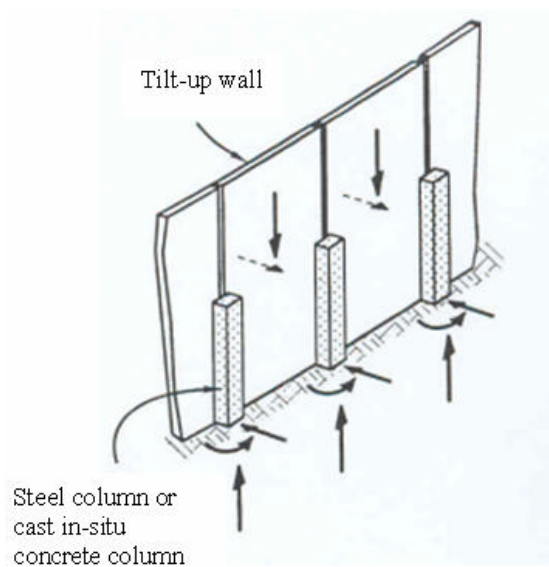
Typical end walls attached to steel columns or cast *in-situ* concrete columns (Restrepo *et al.*, 1996)
